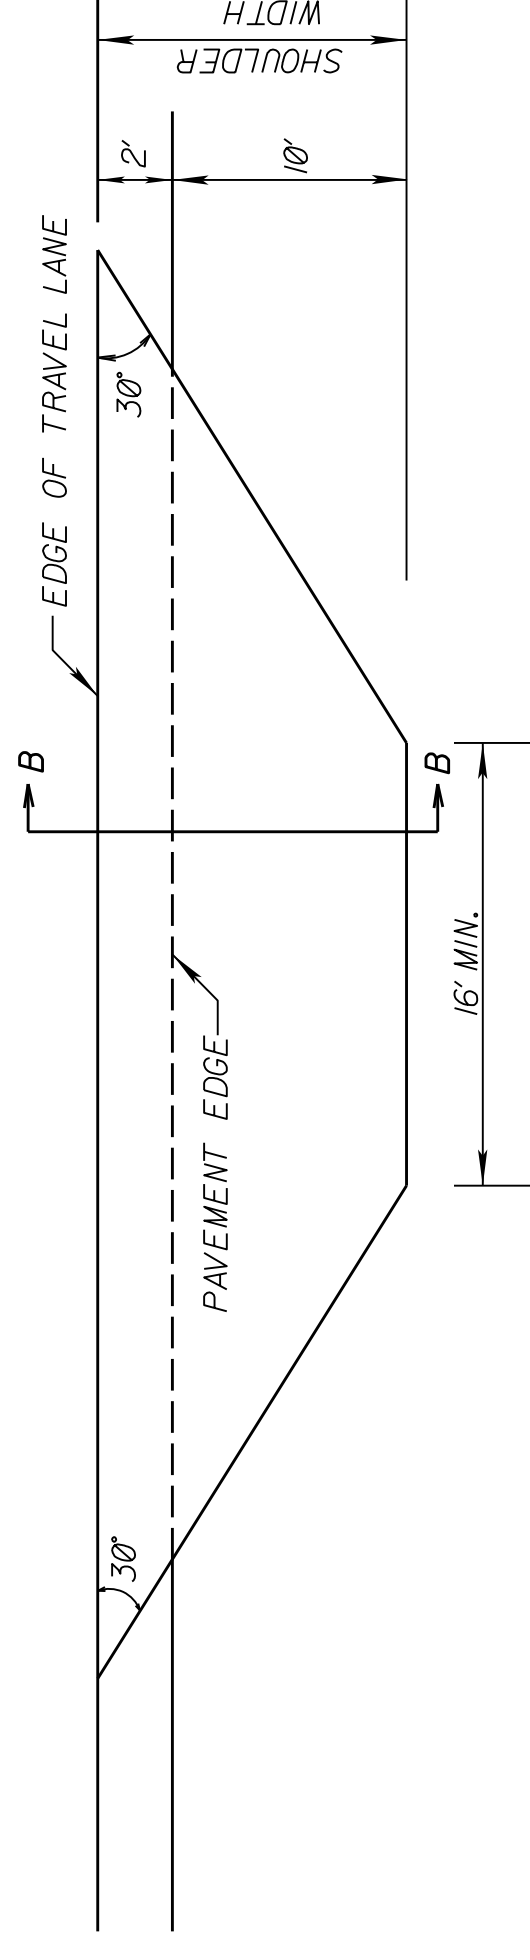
DETAIL FOR PAVEMENT TRANSITION AT BRIDGE ENDS
